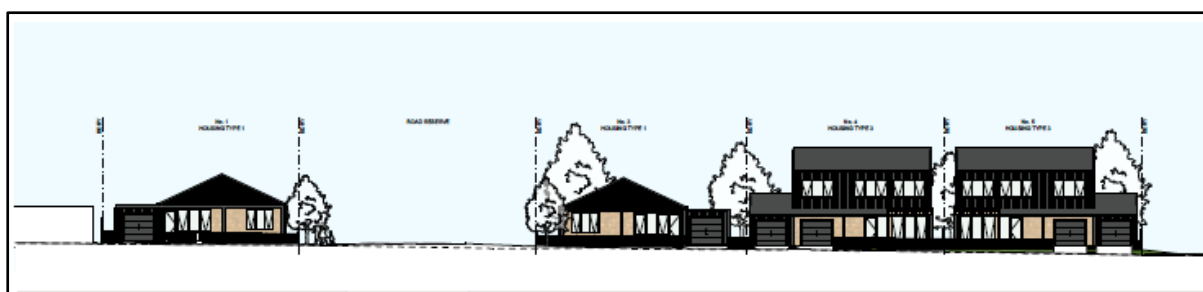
Extract from Architectural Plans – Site Section 01 (Burrundulla Avenue elevation)
